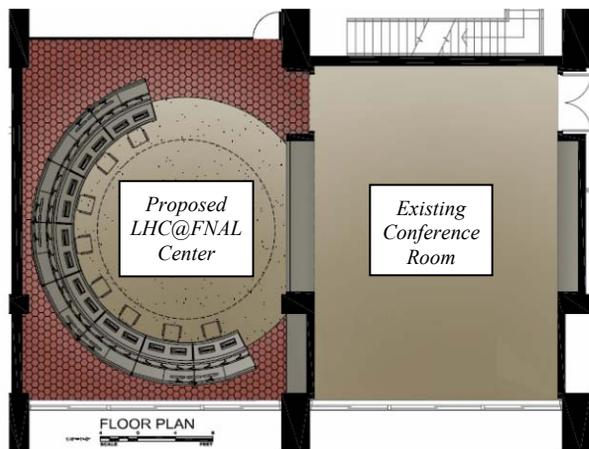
, Floor plan of the LHC@FNAL facility at Fermilab
